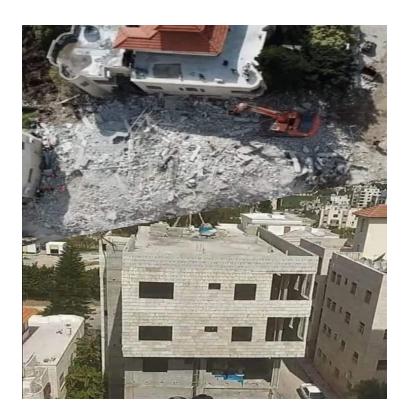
1: A Building in Tulkarm Before and after the collapse⁴¹⁷
